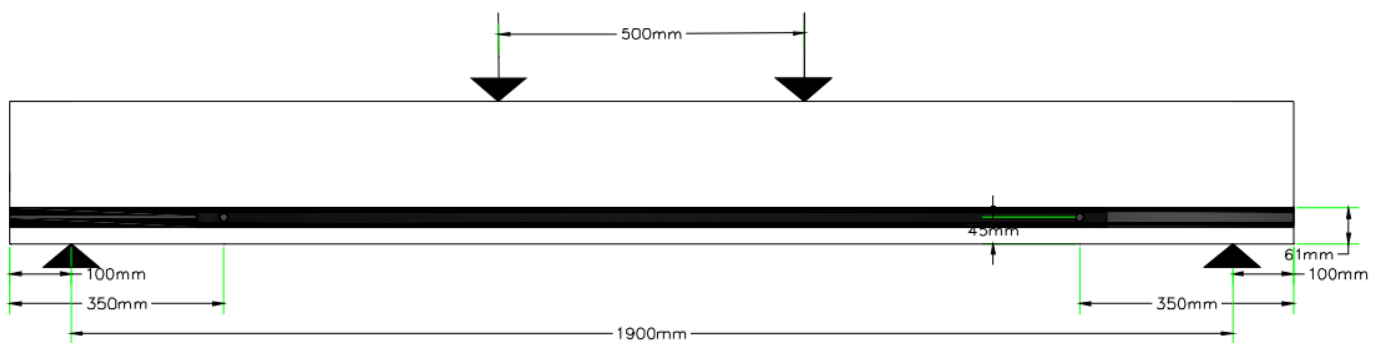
Beam details of the specimen used by Wrya et al. [20].
